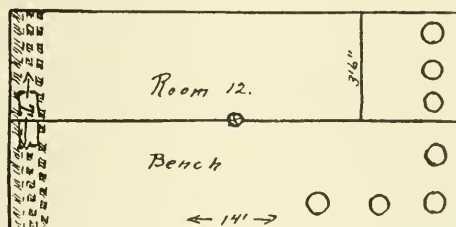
Ground plan of room 12, showing arrangement of storage jars below the bench level.
